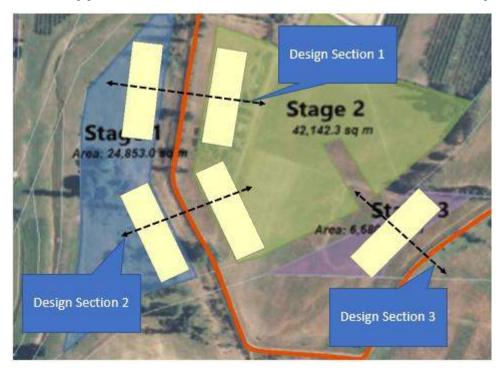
Site Location Plan showing design sections used in slope stability analysis
